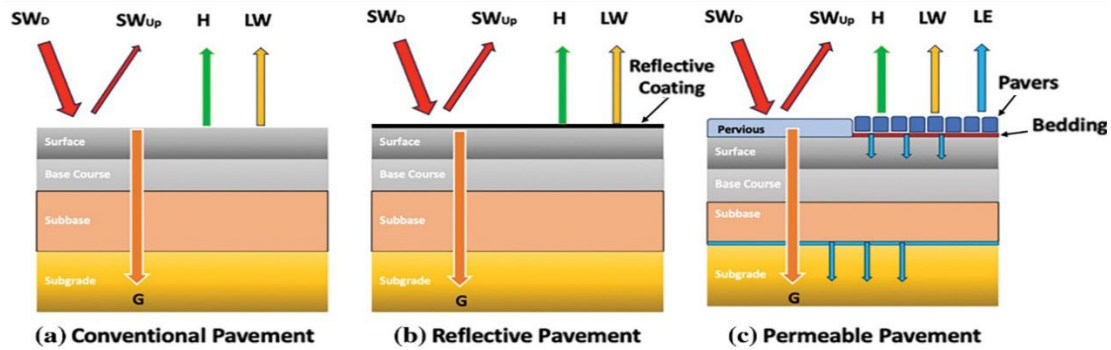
Pavement mechanism works, Source: (Wang C, W. Z., 2021).
